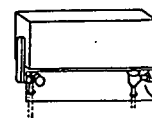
HEATING UNIT VALVES BEHIND GRILLE
